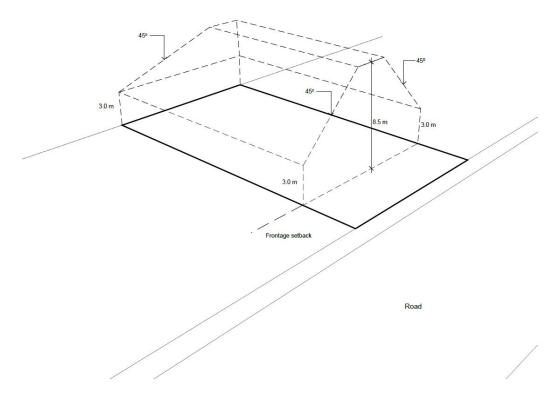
Building envelope as required by clause 8.4.2 A3(a) and clause 8.5.1 A2(a)
